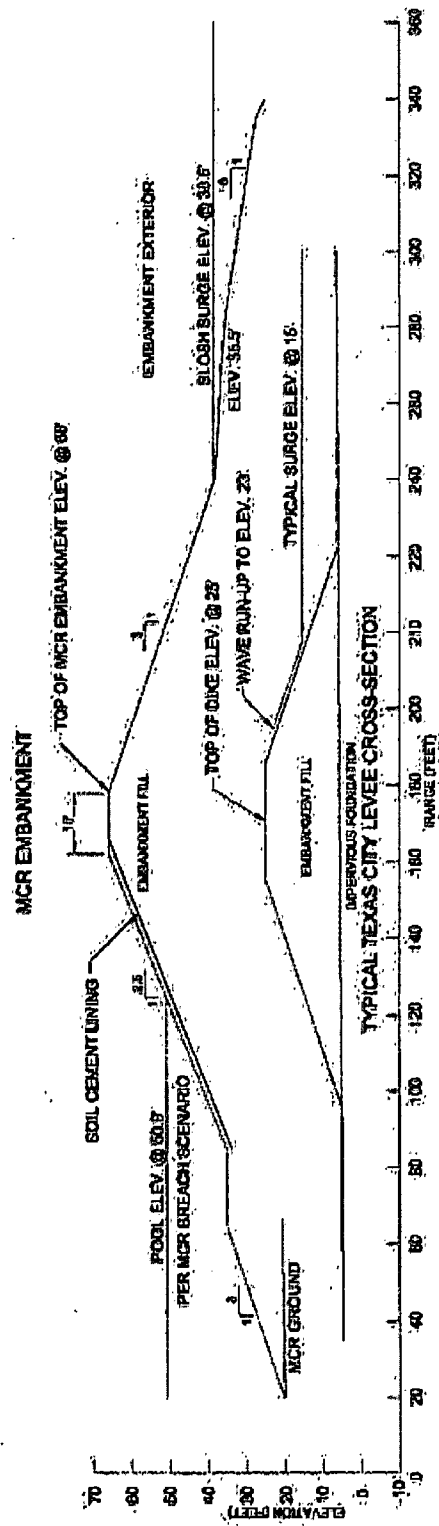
Cross section of northern MCR embankment and a typical Texas City levee.
